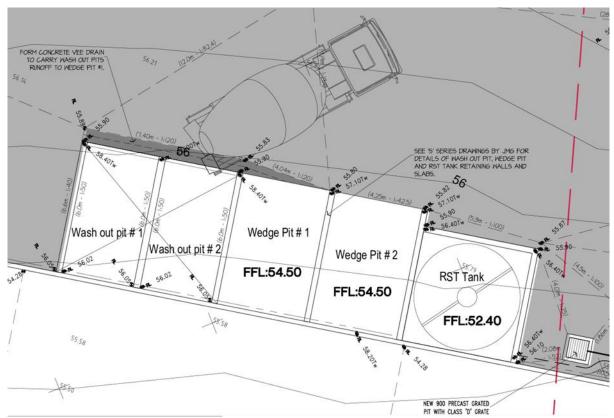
Proposed wash out bays, wedge pits and recycled water tank system for the dry concrete plant
